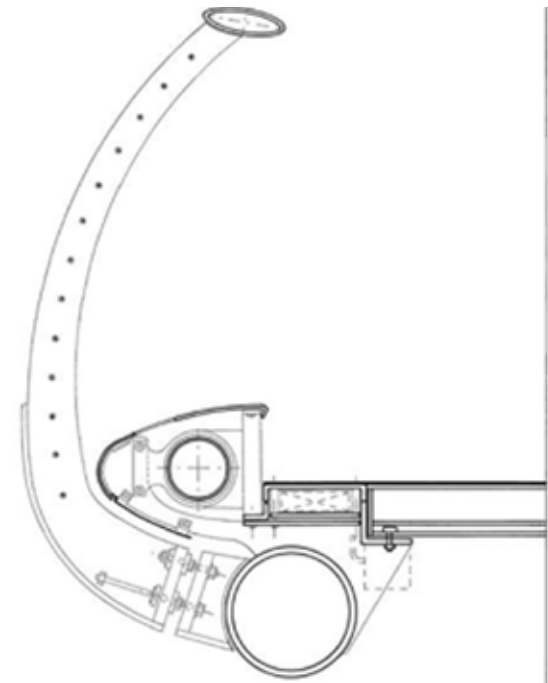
Foster + Partners' detail drawing of the Millennium Bridge, London balustraded and floating aluminium bridge deck
